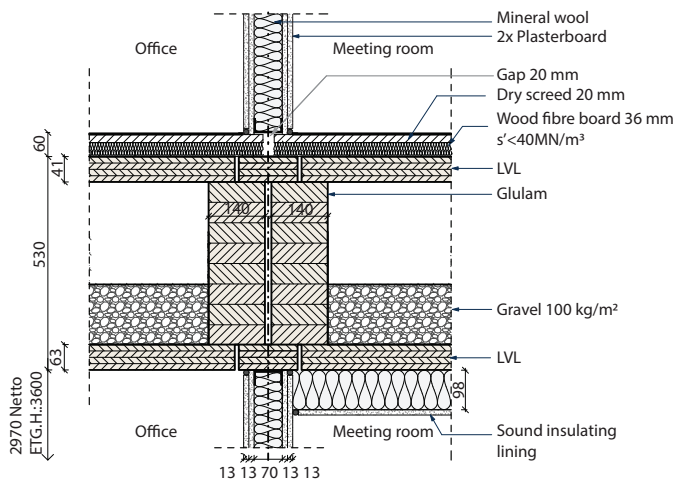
Construction detail for a Norwegian office building. Requirement according to NS 8175:2019, class C. Adapted from [49].
